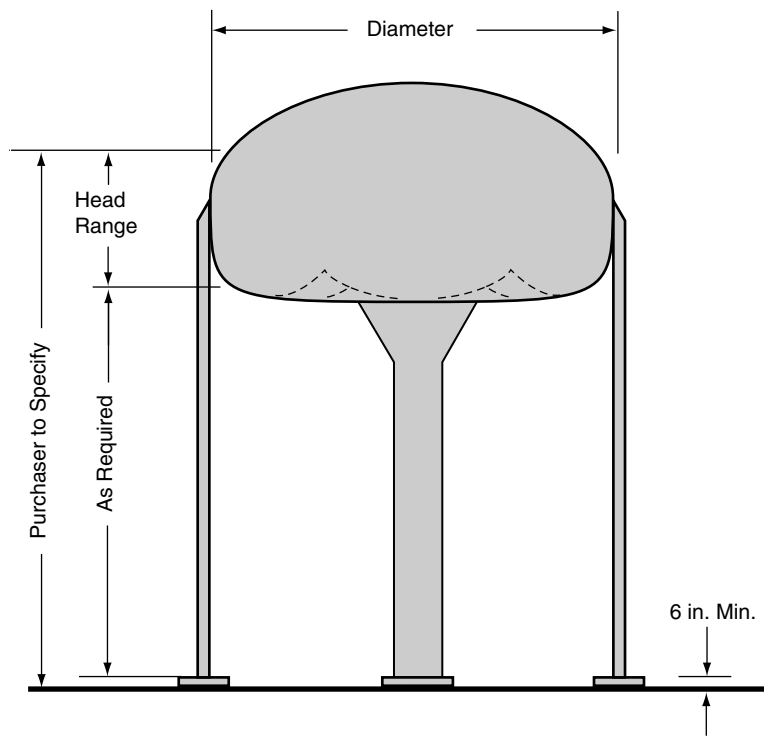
Cross-sectional view of large-capacity, multi-column elevated tank
